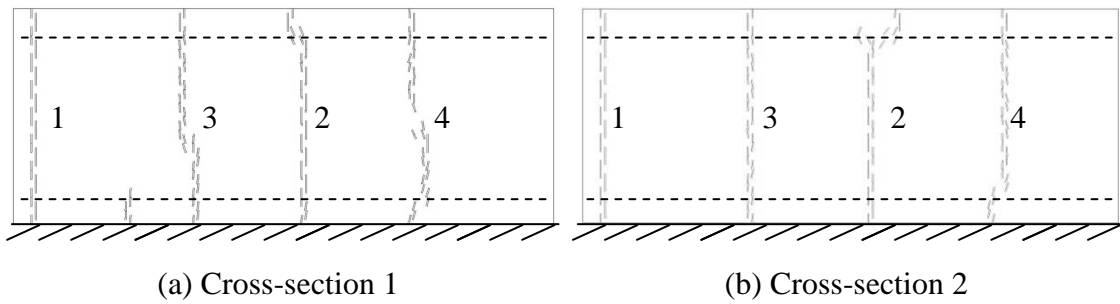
Crack pattern for fully open cracks for (a) cross-section 1 and (b) cross-section 2.
